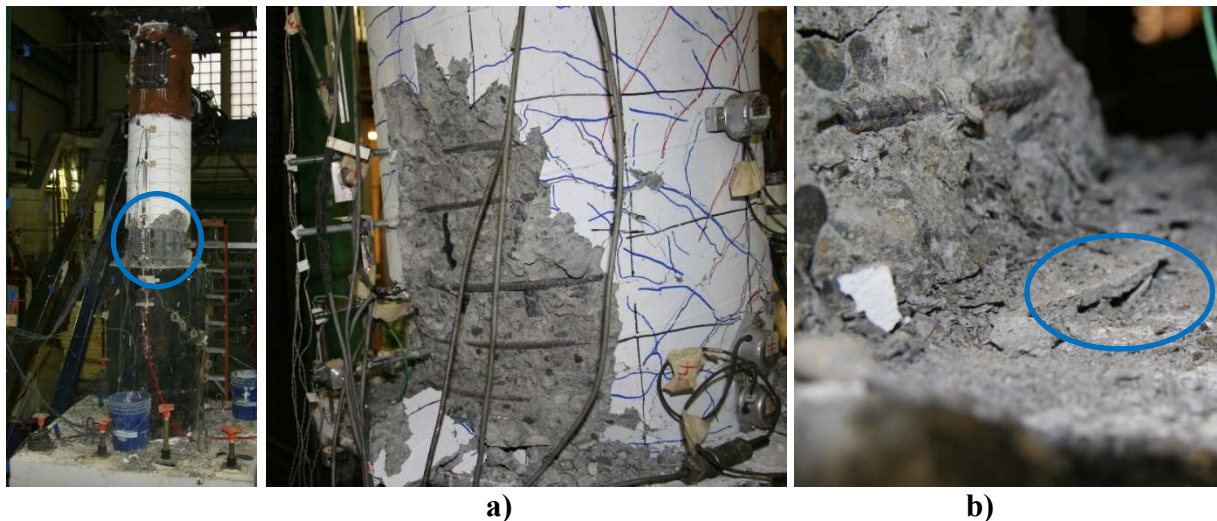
Specimen 30-21 a) Major Spalled Region on Southern Column Face, b) Large Crack at Northern Column Interface at 7.3 % Drift
